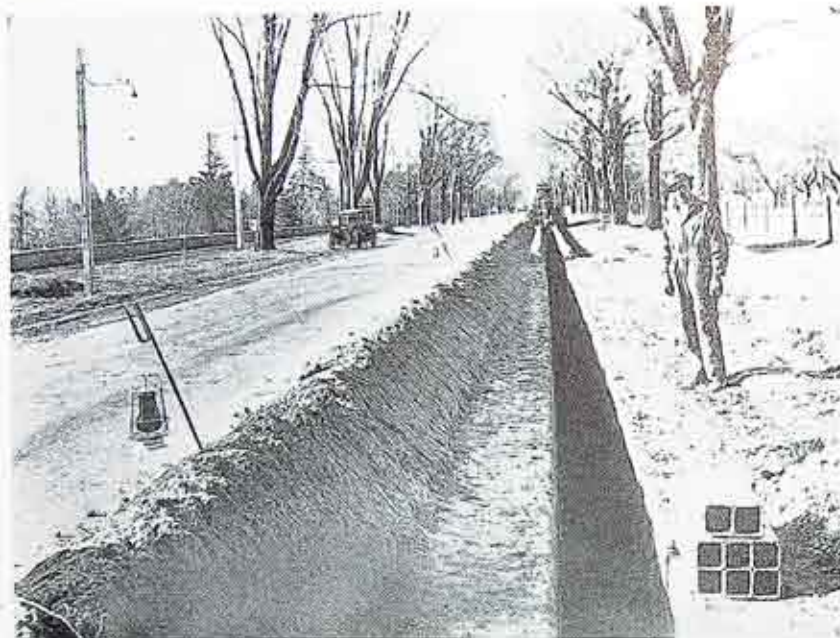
Section of Trench on Charlotte Boulevard Dug by Our Large Ditching Machine. At Right is Shown the Ducts Which are being placed in the Trench.
